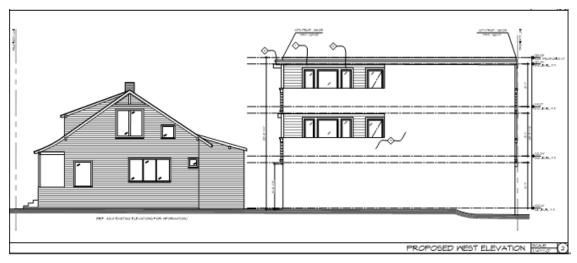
Proposed west (right) façade of new building with the west façade of the bungalow at left. Source: A3.11, Peha & Associates Architecture, December 21, 2017.
